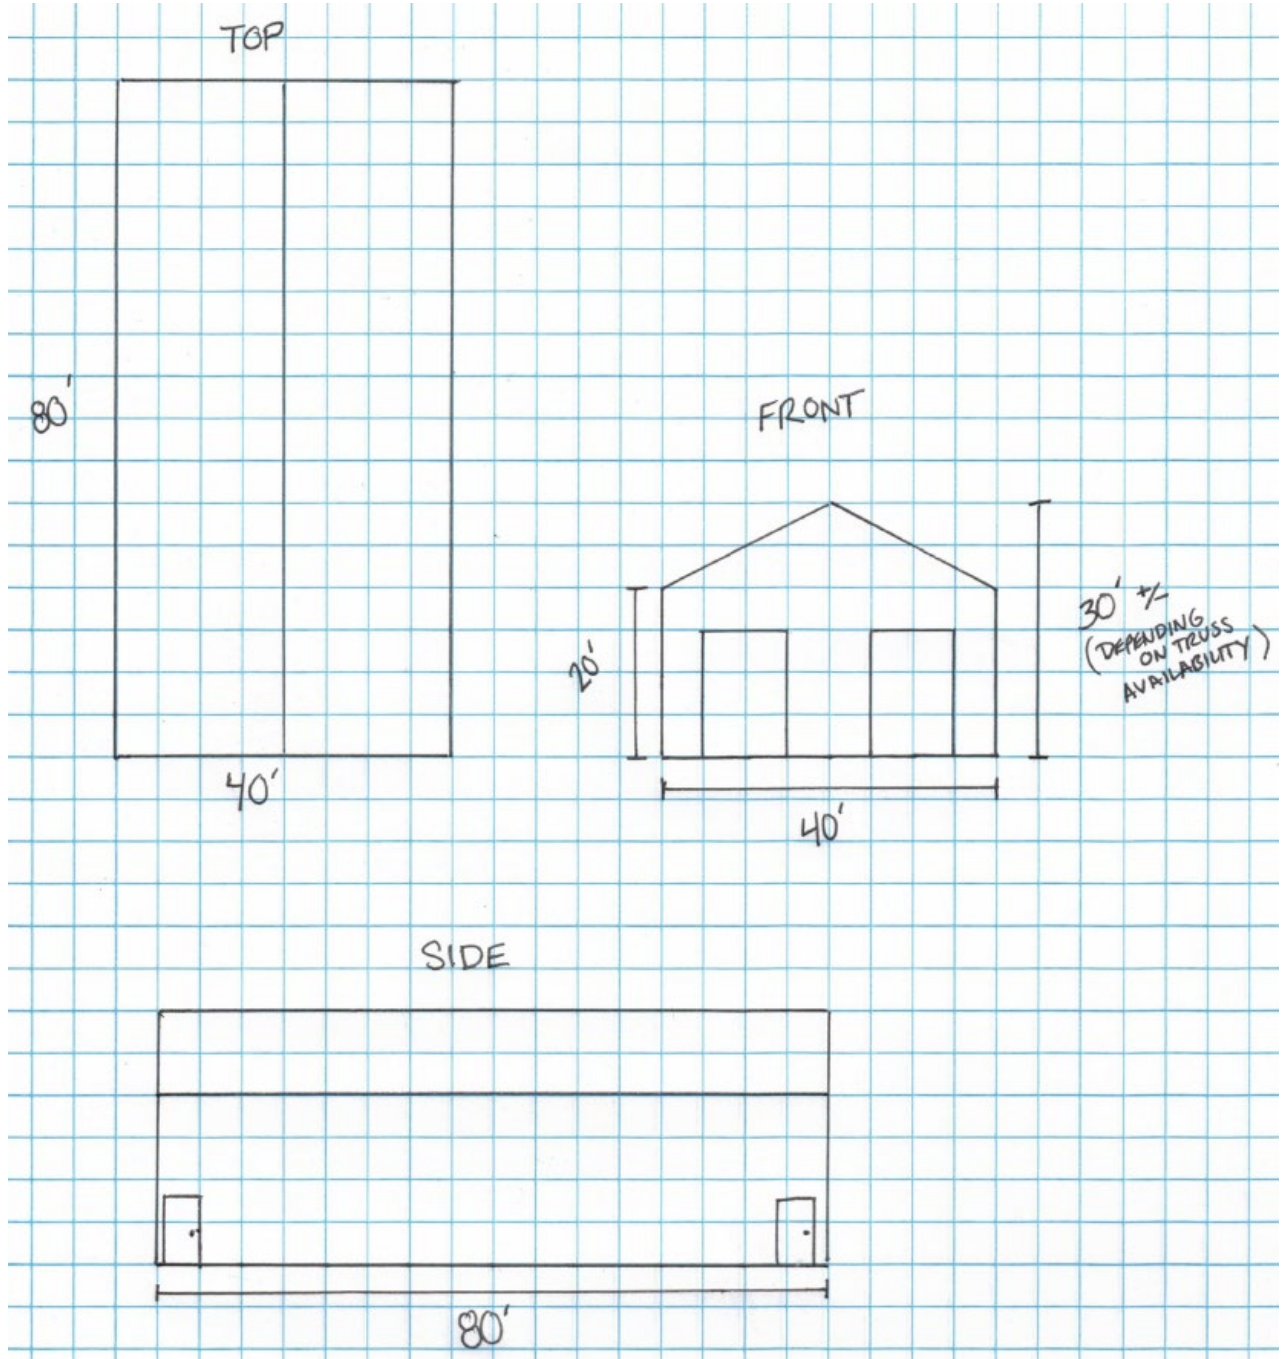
Drawn elevation of the proposed barn at 9621 E 96<sup>th</sup> Street.
